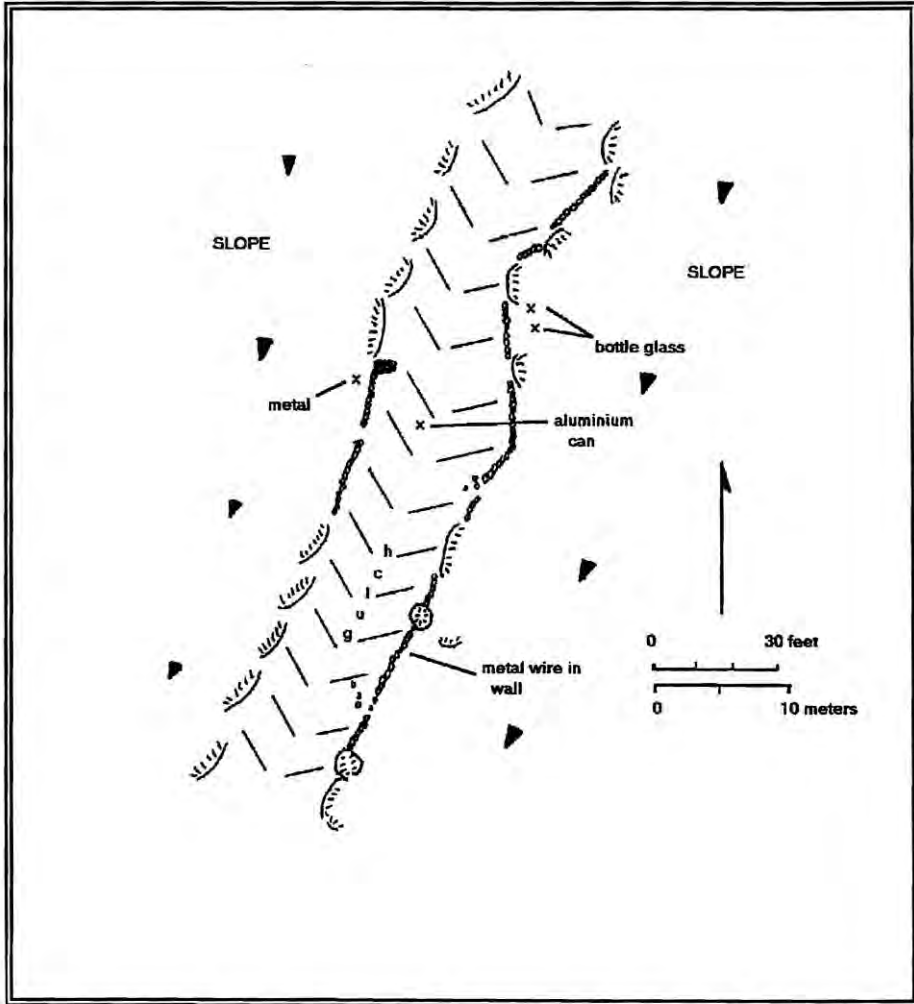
Site 3740 – Plan view: Erosion containment wall system.
